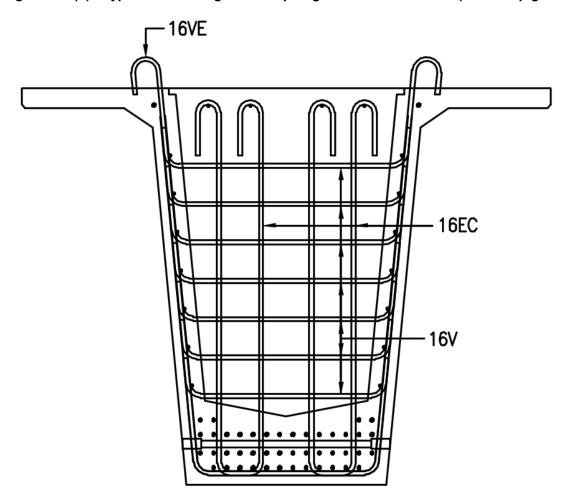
(b) - Typical reinforcing set in diaphragms and around voids (1500 deep girders)
